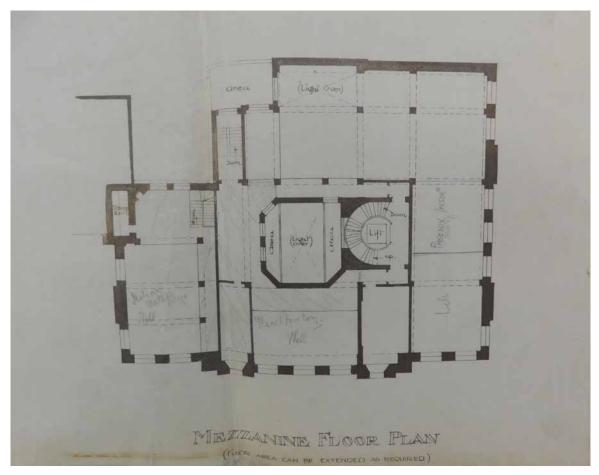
1912 Mezzanine floor plan of 12 Waterloo Place, WPA
